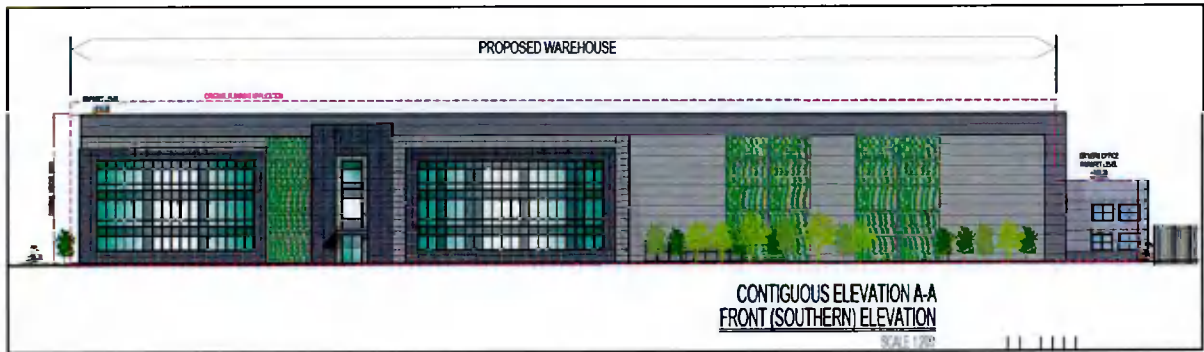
Contiguous Elevation A-A Showing Location of Proposed Green Walls
